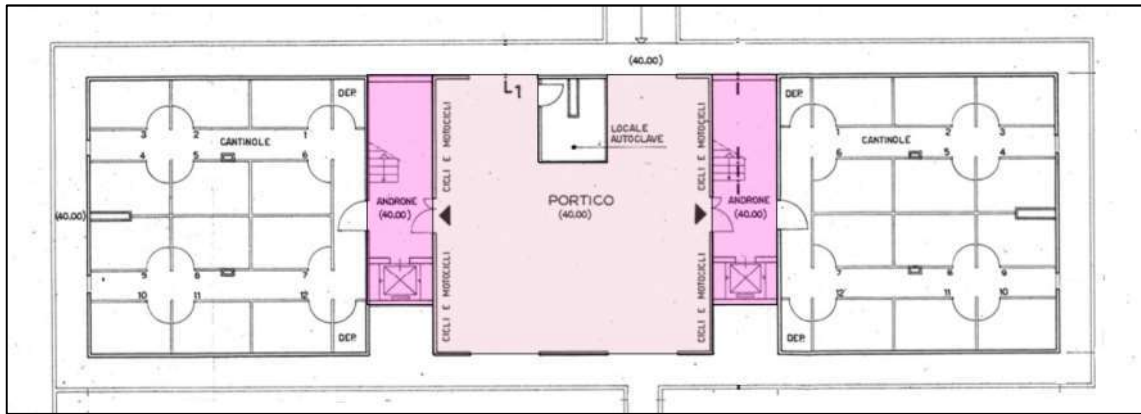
Ground floor plant with the identification of the porches and stairwells.
